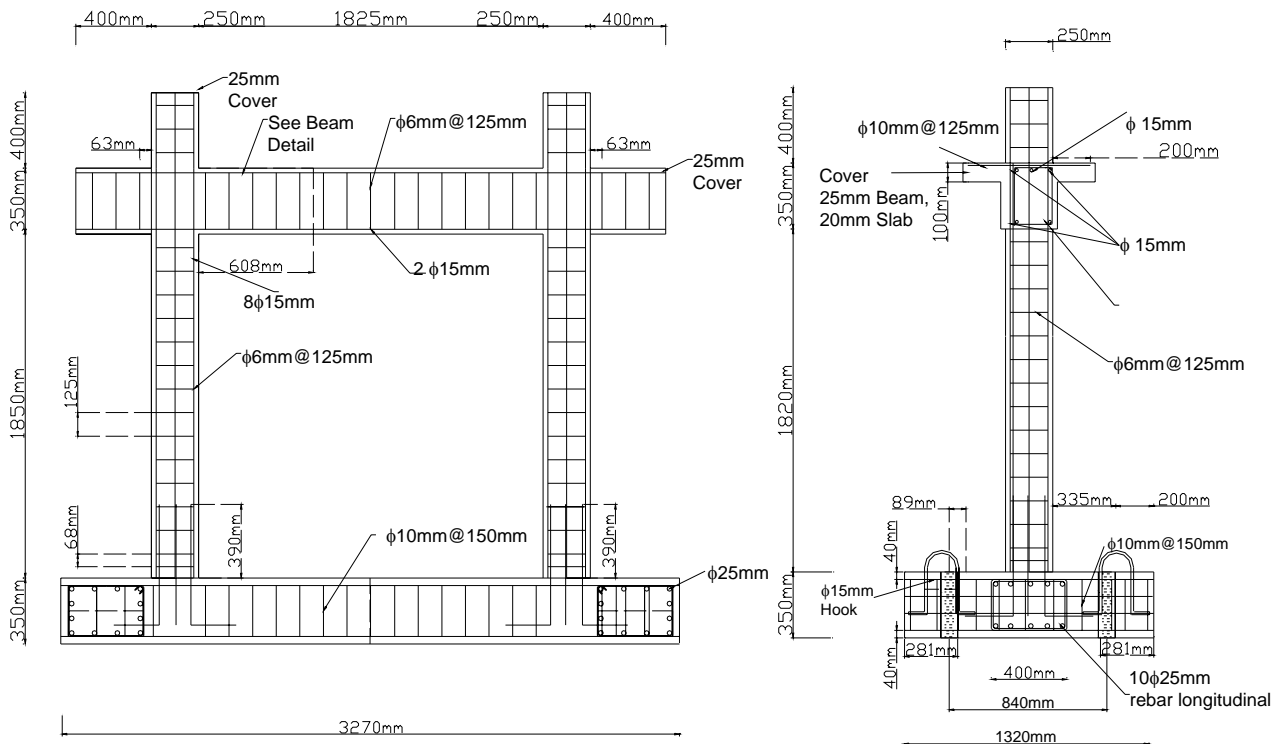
Gravity load designed reinforced concrete dimensions and reinforcement
